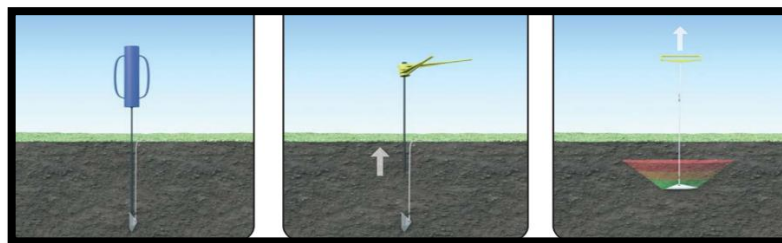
Installation of flip anchor system (Source: Platipus Civil Engineering &Construction Brochure, 2022)
